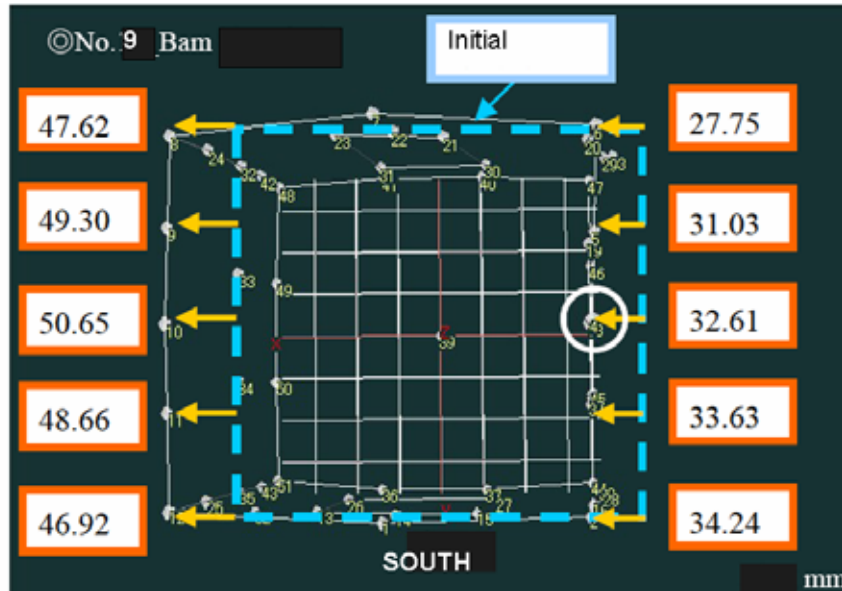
Horizontal Deformation of Test House at Roof Position of No.9 in mm
